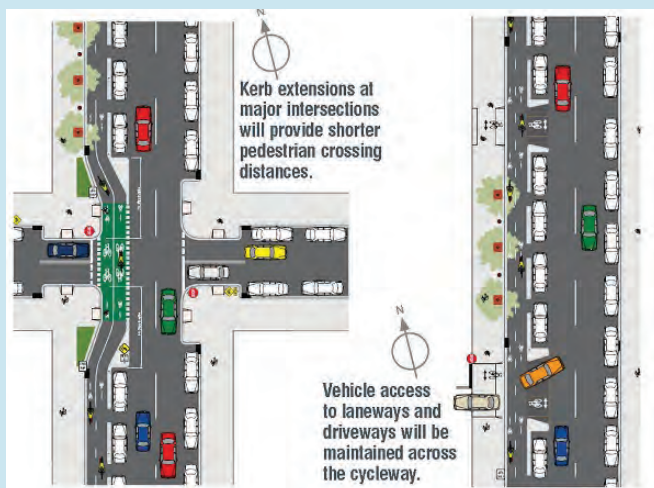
Bourke Street bicycle route typical layouts⁴⁵
